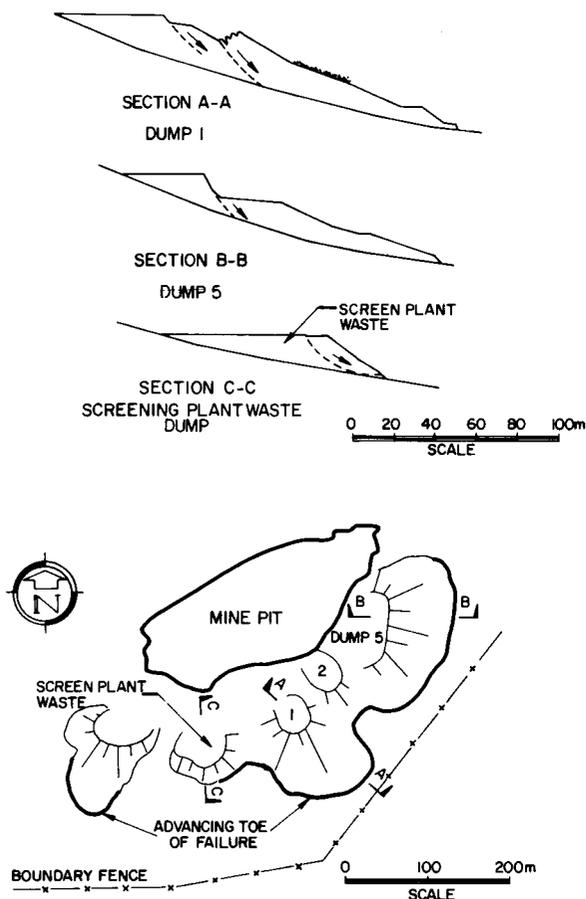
Sections through failing waste dumps, and plan showing areas affected by failures
